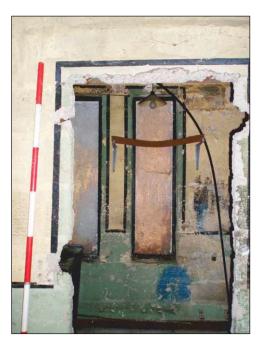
View from the first-floor corridor of windows in west elevation and original Art Deco style wall paint, looking west-southwest. (1.2m scale)
